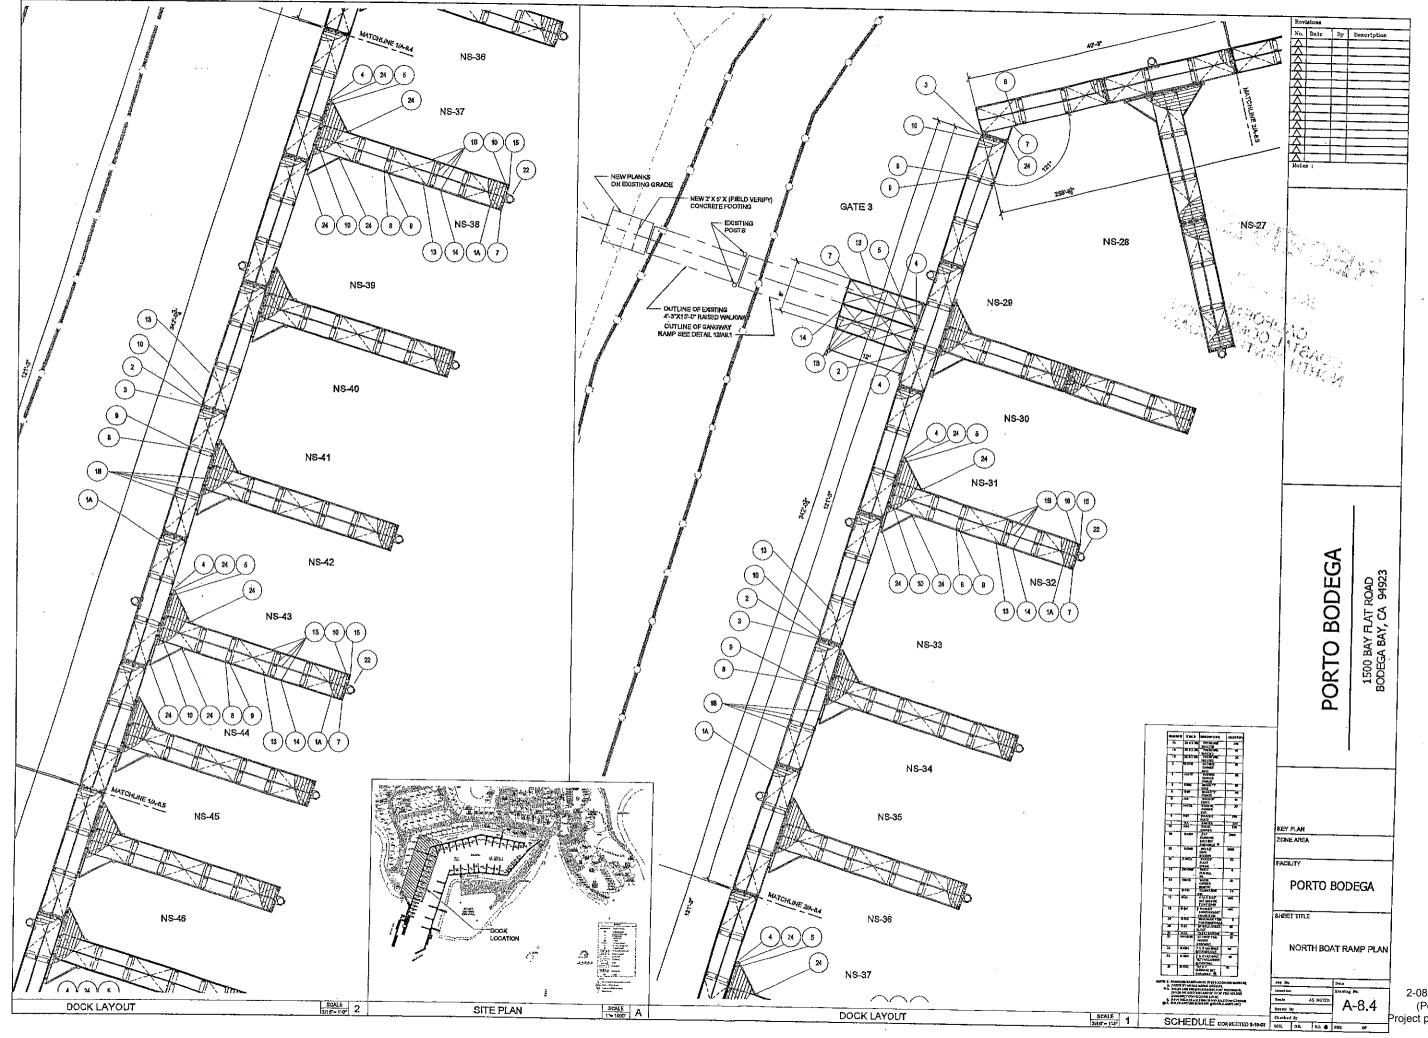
2-08-013 & 2-10-030 (Porto Bodega LP) Project plans and photos Page 6 of 14
